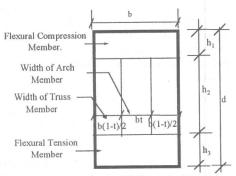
Cross -Section of Concrete Beam in the Modified Lattice Model
